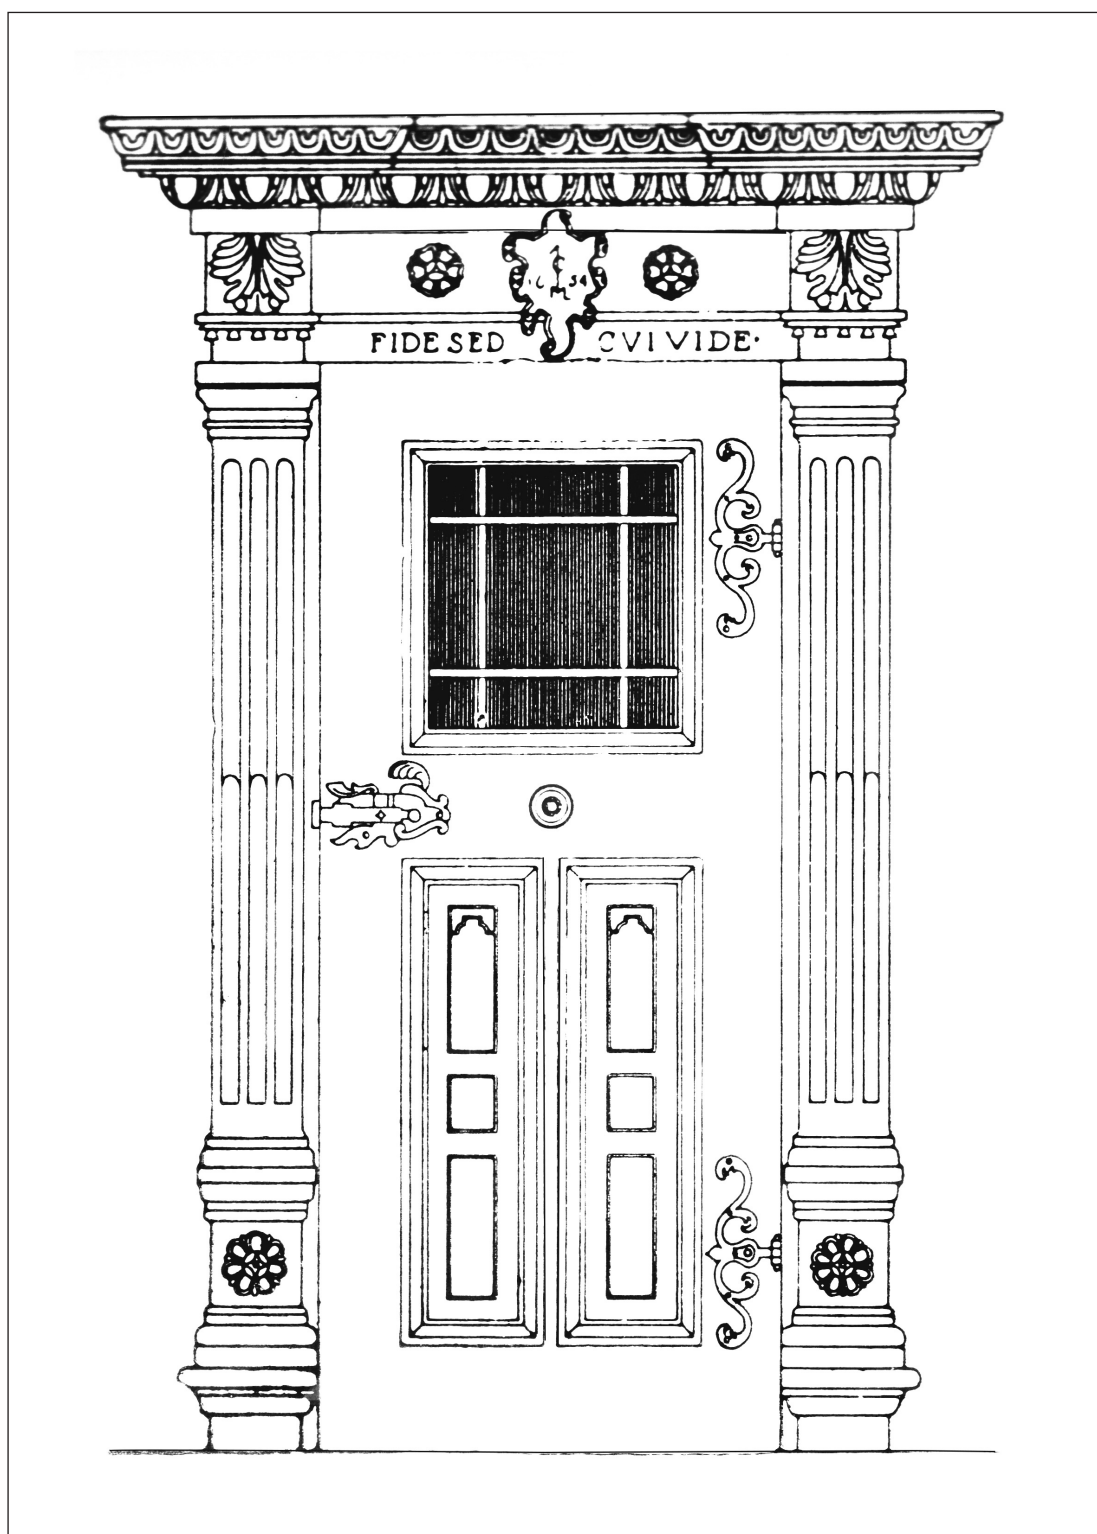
Renaissance portal in the ground-floor room facing the street, drawing by architect Lajos Pákei, 1918 (Balogh 1944, pl. XXVII).
